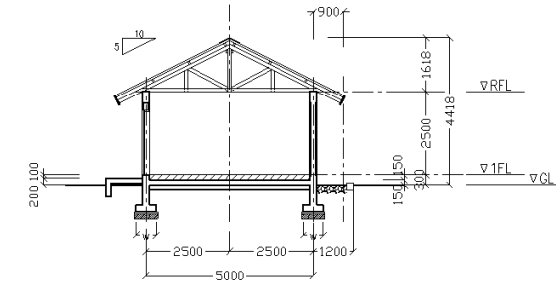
Elevation and Section of Batu Ampar VTS Center
